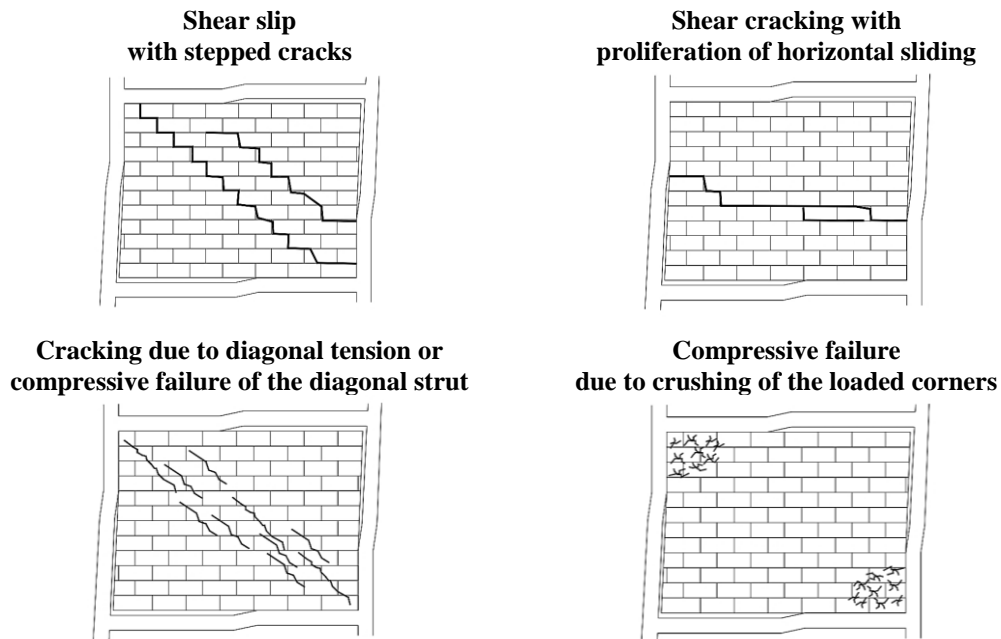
Crack propagation due to common masonry infill in-plane failure modes
